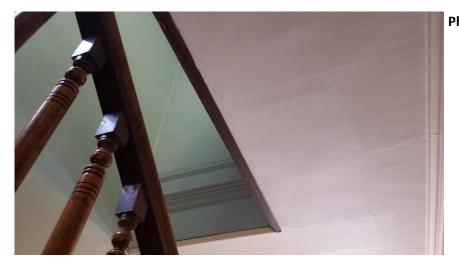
Typical new nonasbestos wall and ceiling plaster on the first floor and stairwell.
